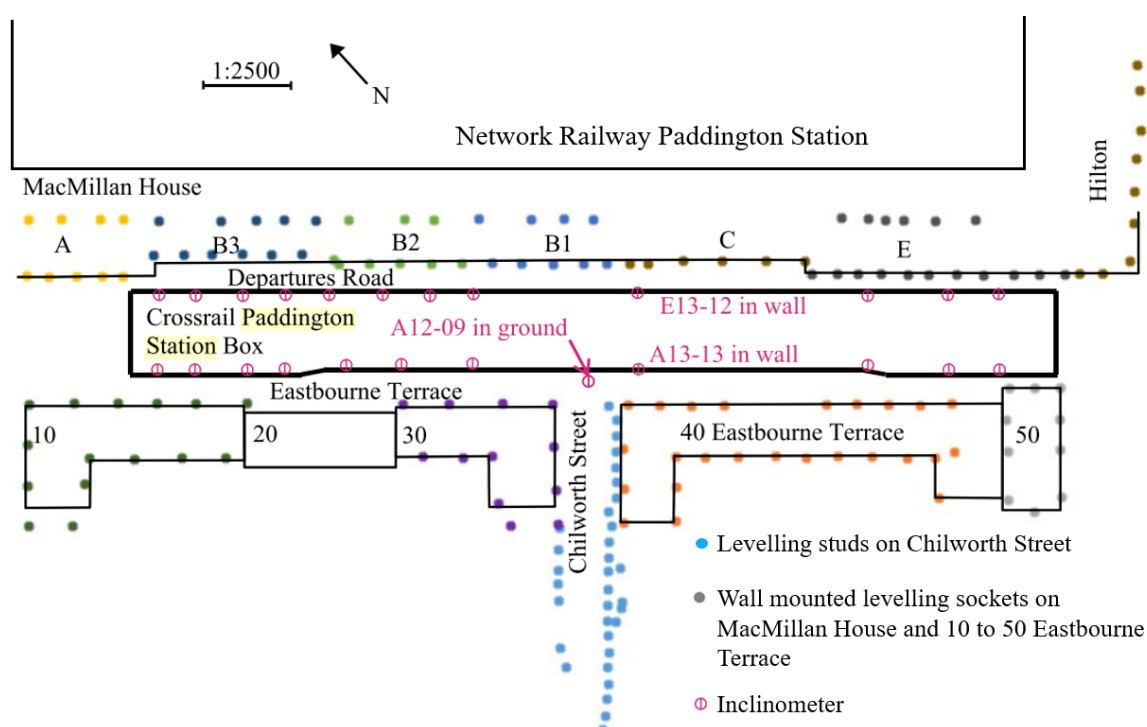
29 PAD station box construction monitoring instrument layout plan (Bologna, 2017)
